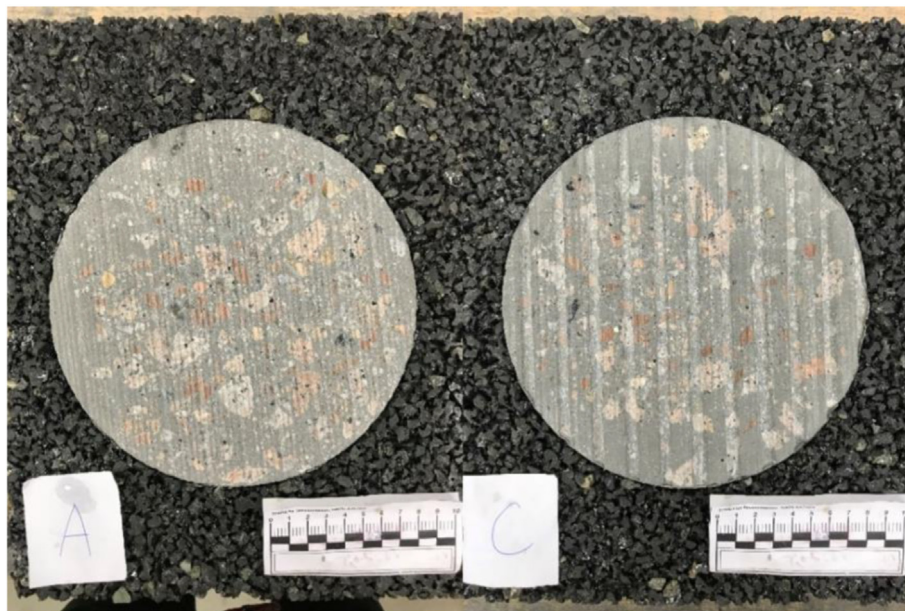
The diamond grinding (left) and diamond grinding & grooving (right) surfaces after APM test (Lu et al, 2021).
